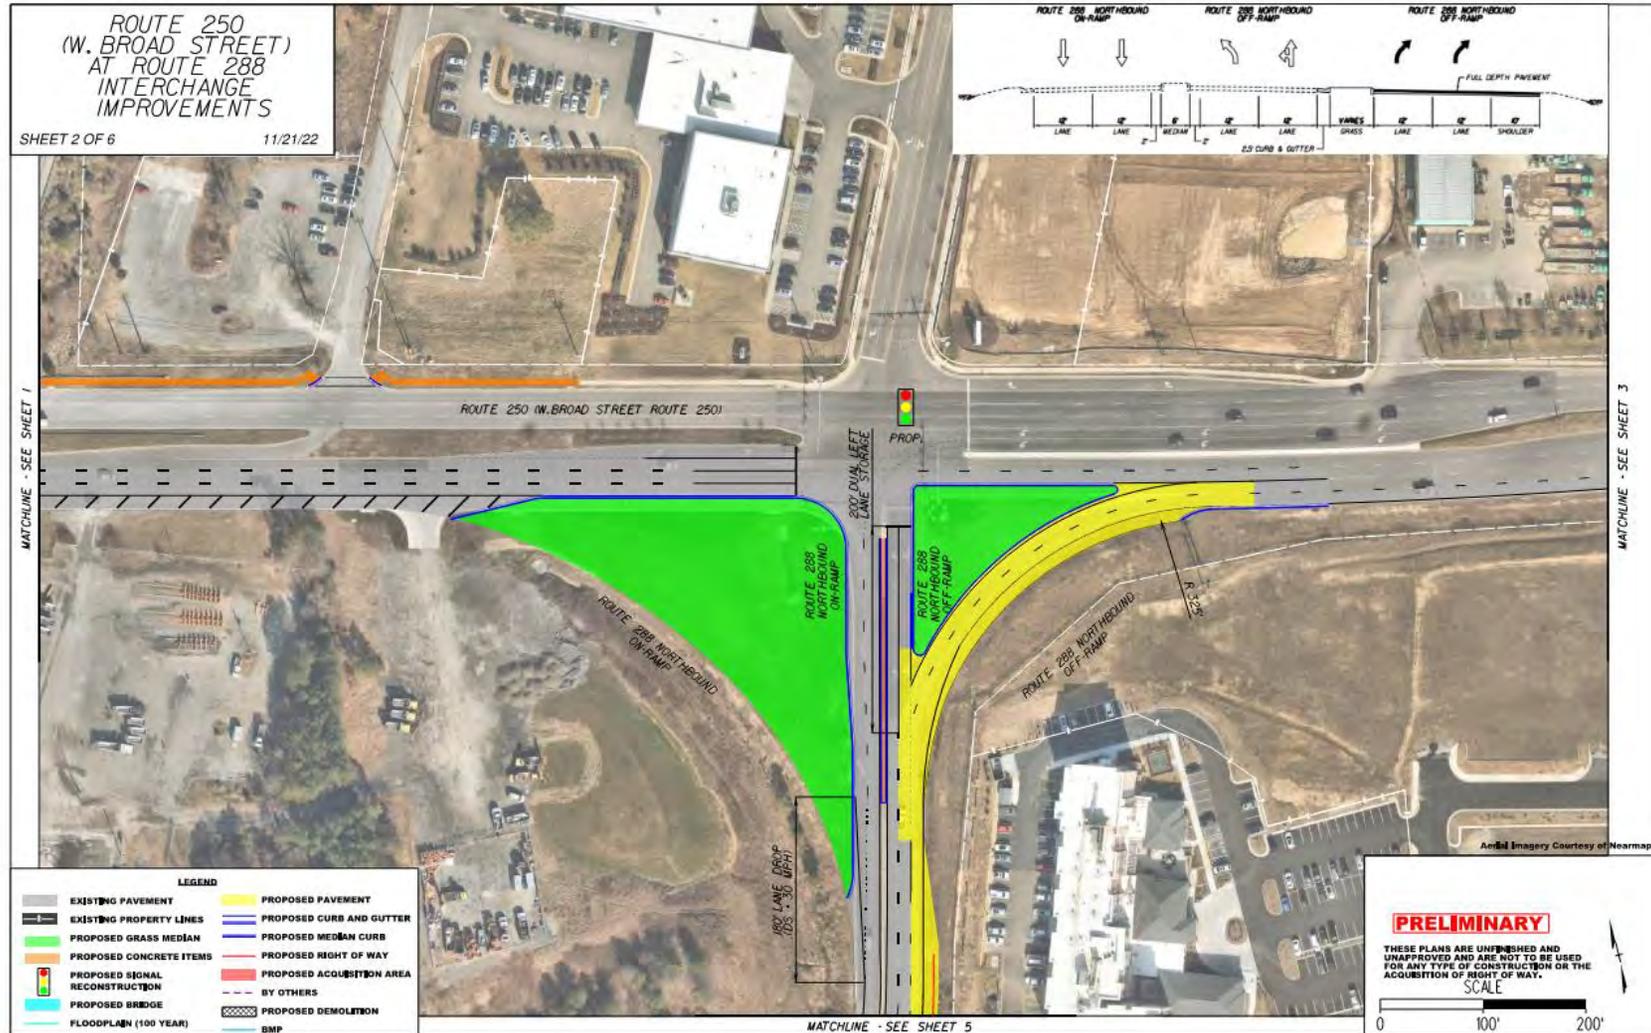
Route 288 at US 250 Ramp and Ramp Terminal Improvements (3)
